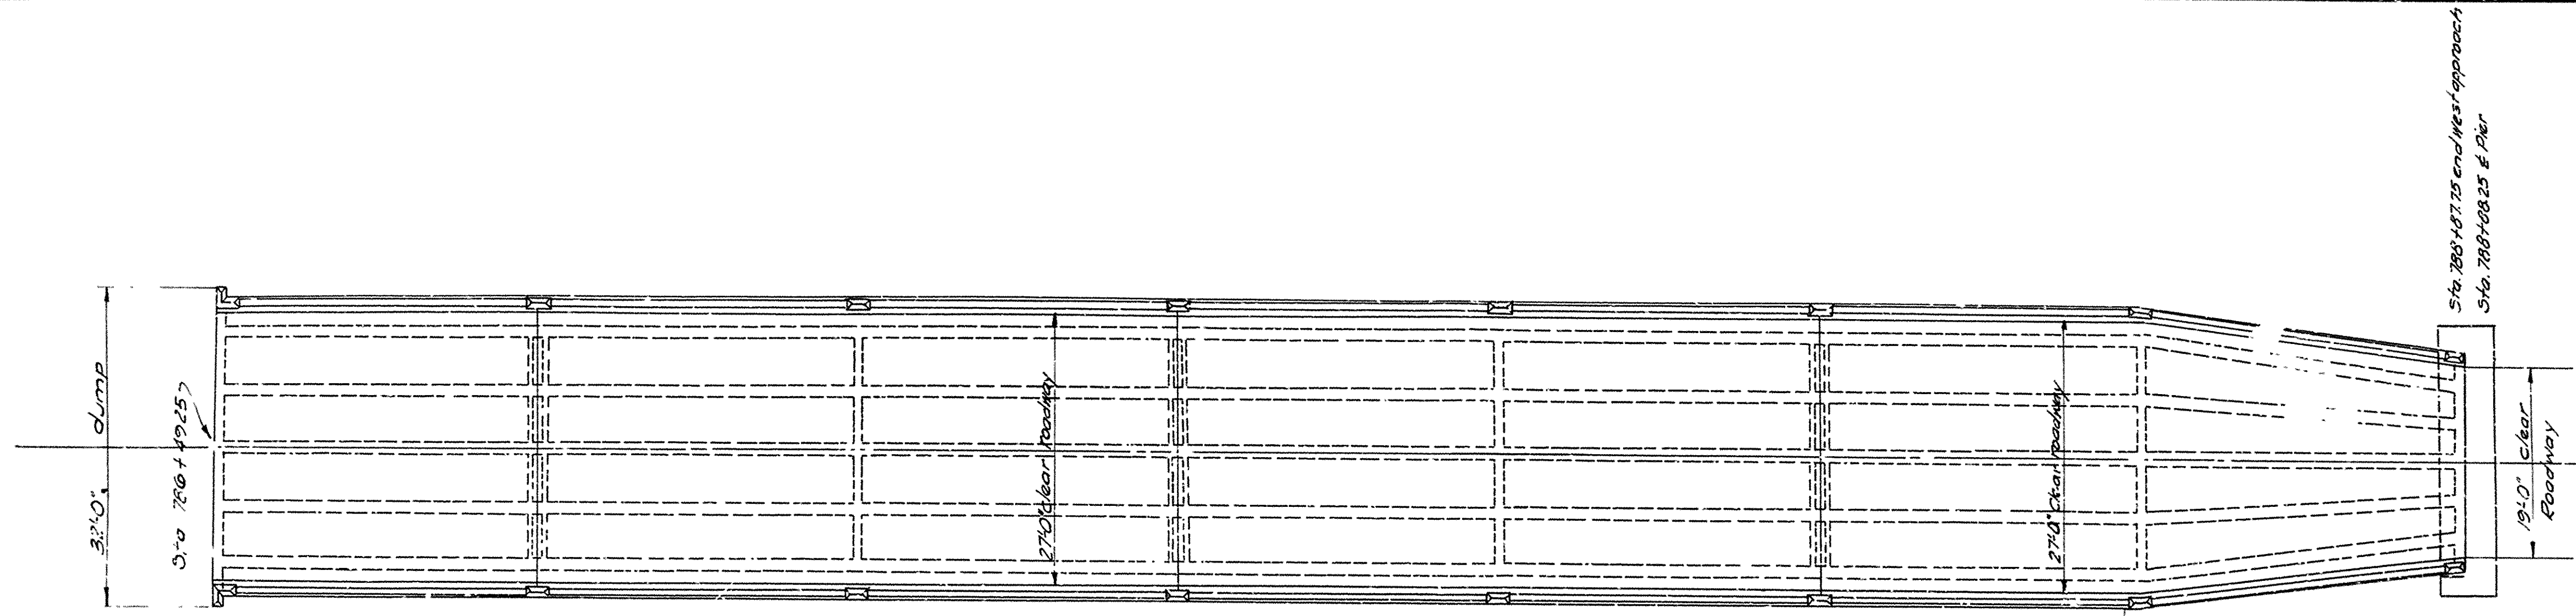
DETAILS OF APPROACH SLAB AND REPAIRS TO WHITE RIVER BRIDGE
